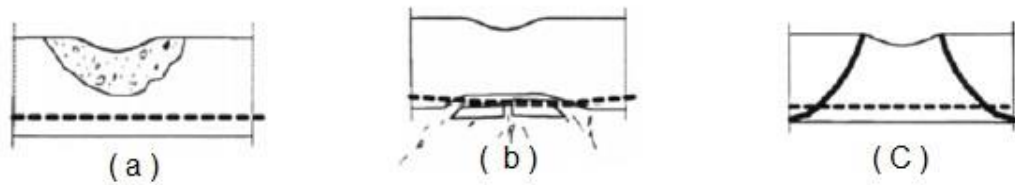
Contact area failure involving steel reinforced concrete beam: (a) Local crushing and spalling in the contact zone, (b) Local effect of scabbing, (c) Formation of the concrete plug, [190].
